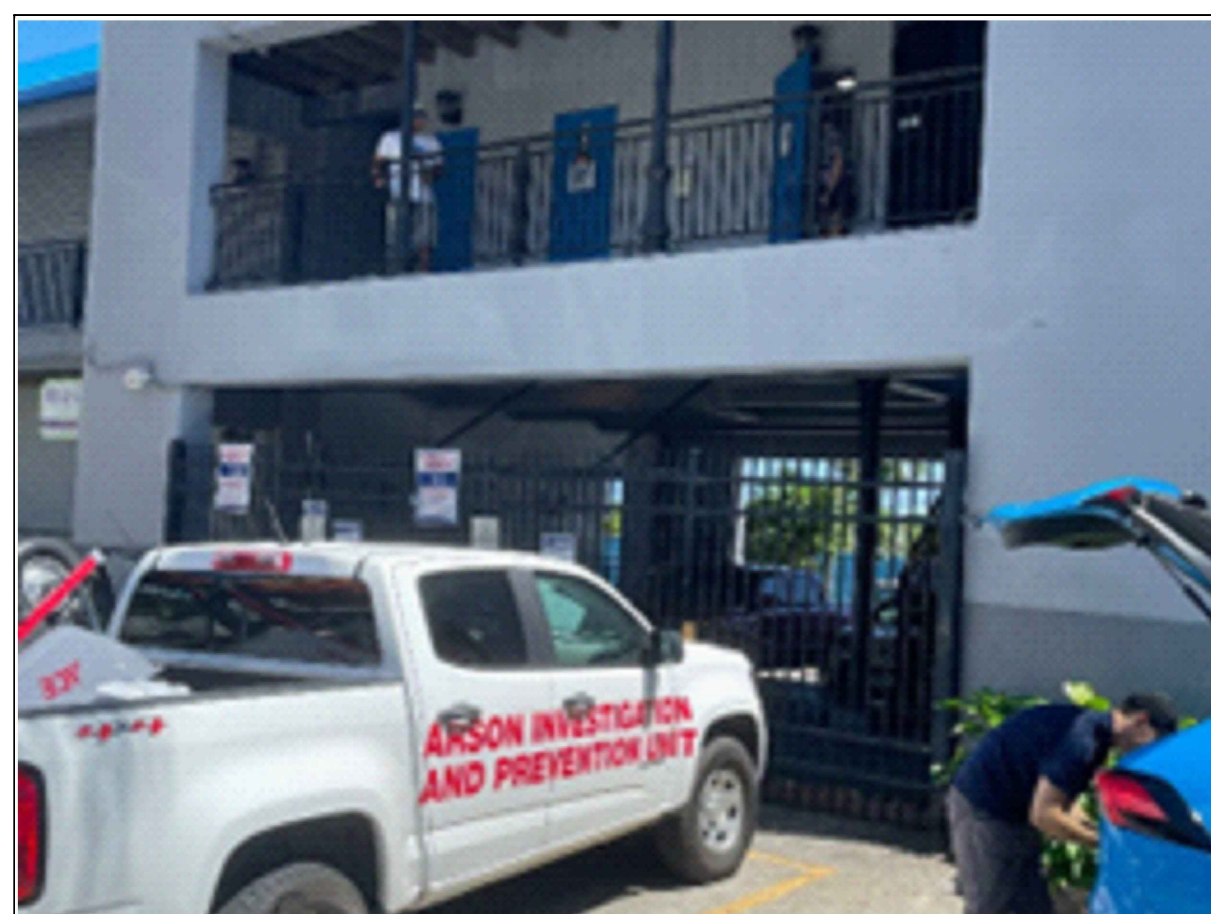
VIEW OF 1ST FLOOR FOR PROPOSED LOCATION OF NEW INFILL CONSTRUCTION WITHIN EXIST BUILDING ENEVELOPE
